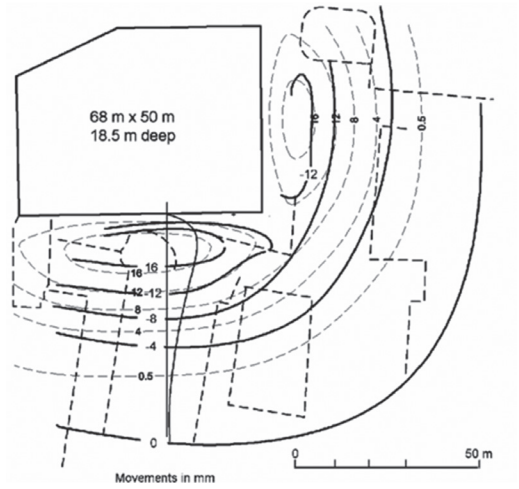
Ground surface settlement contours at New Palace Yard—observed and predicted.
